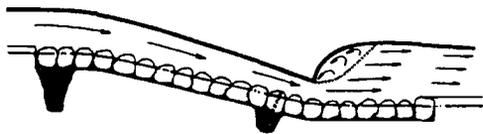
Grouted Sloping Boulder Drop (after UDFCD, 1990)
